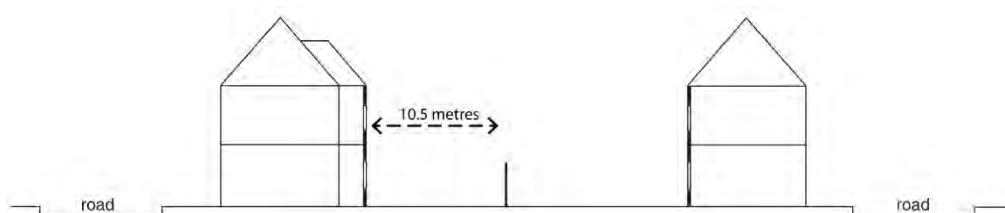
A minimum garden depth of 10.5 metres will ensure adequate private outdoor space.
